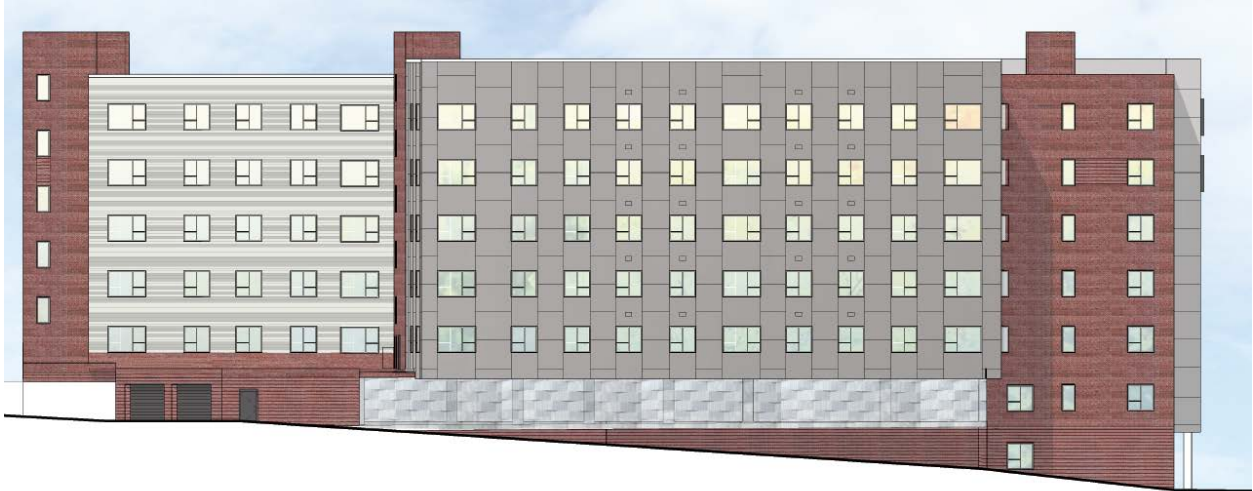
Option 2, Southeast Elevation (As seen from New Private Access Road).
